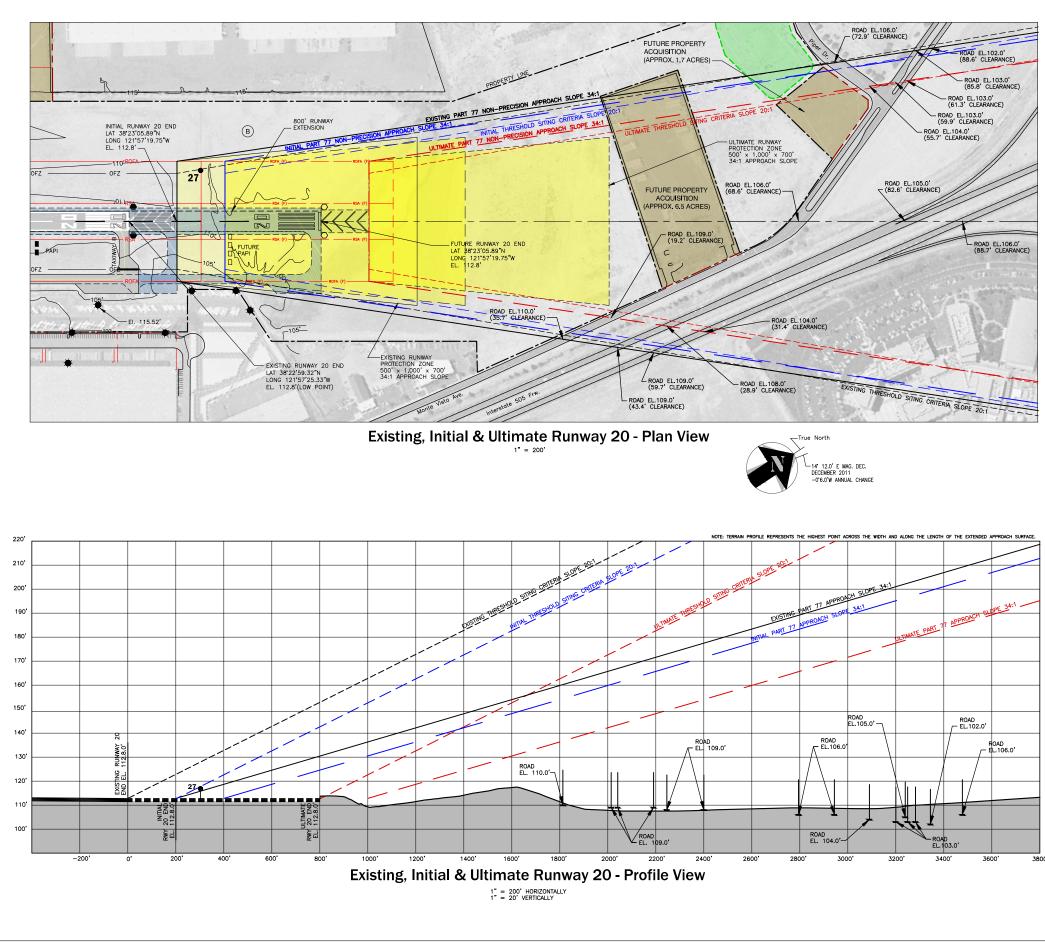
Inner Portion of the Approach Surface Plan, Runway 20 (Plan & Profile Views)
